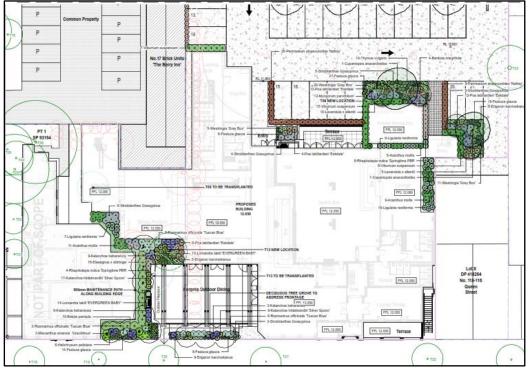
Extract from proposed Landscape Plan – Berry Hotel and car park Source: H&E Architects
